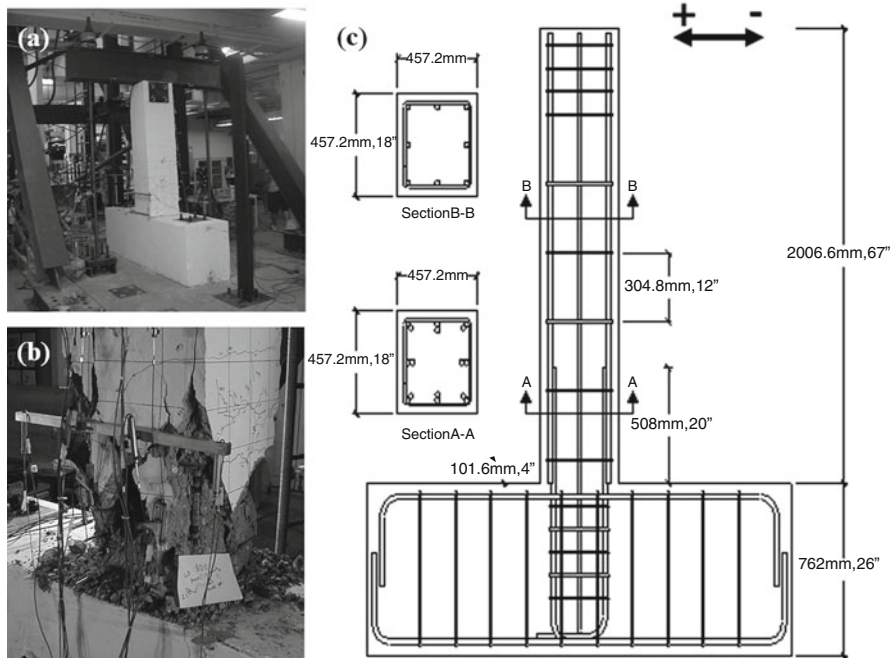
Lap-spliced column specimens: (a) test setup, (b) observed damage, (c) reinforcement configuration
